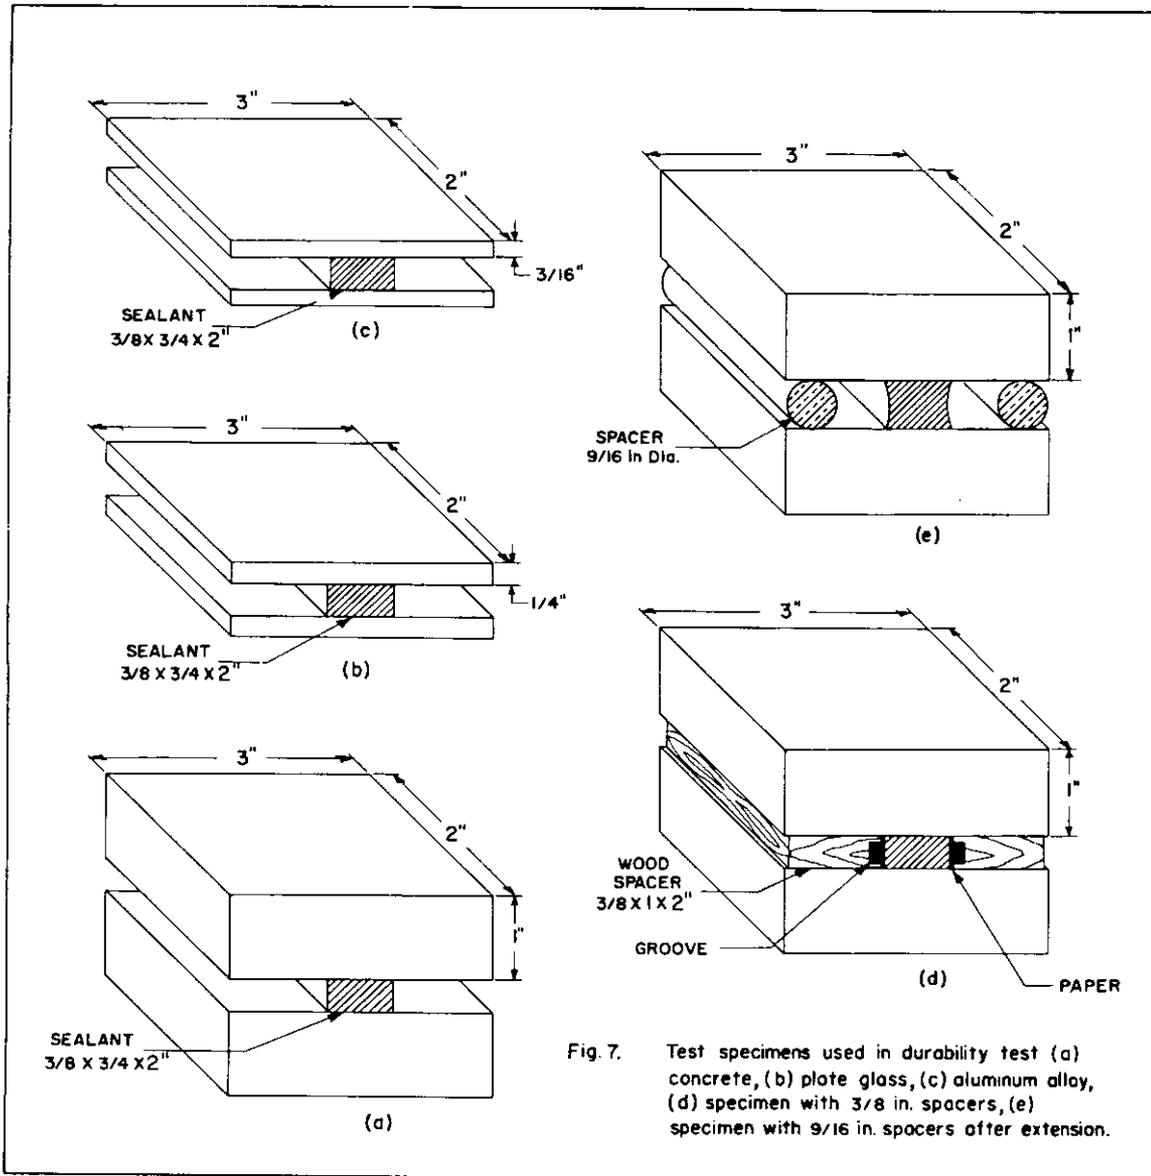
Test specimens used in durability test (a) concrete, (b) plate glass, (c) aluminum alloy, (d) specimen with 3/8 in. spacers, (e) specimen with 9/16 in. spacers after extension.
